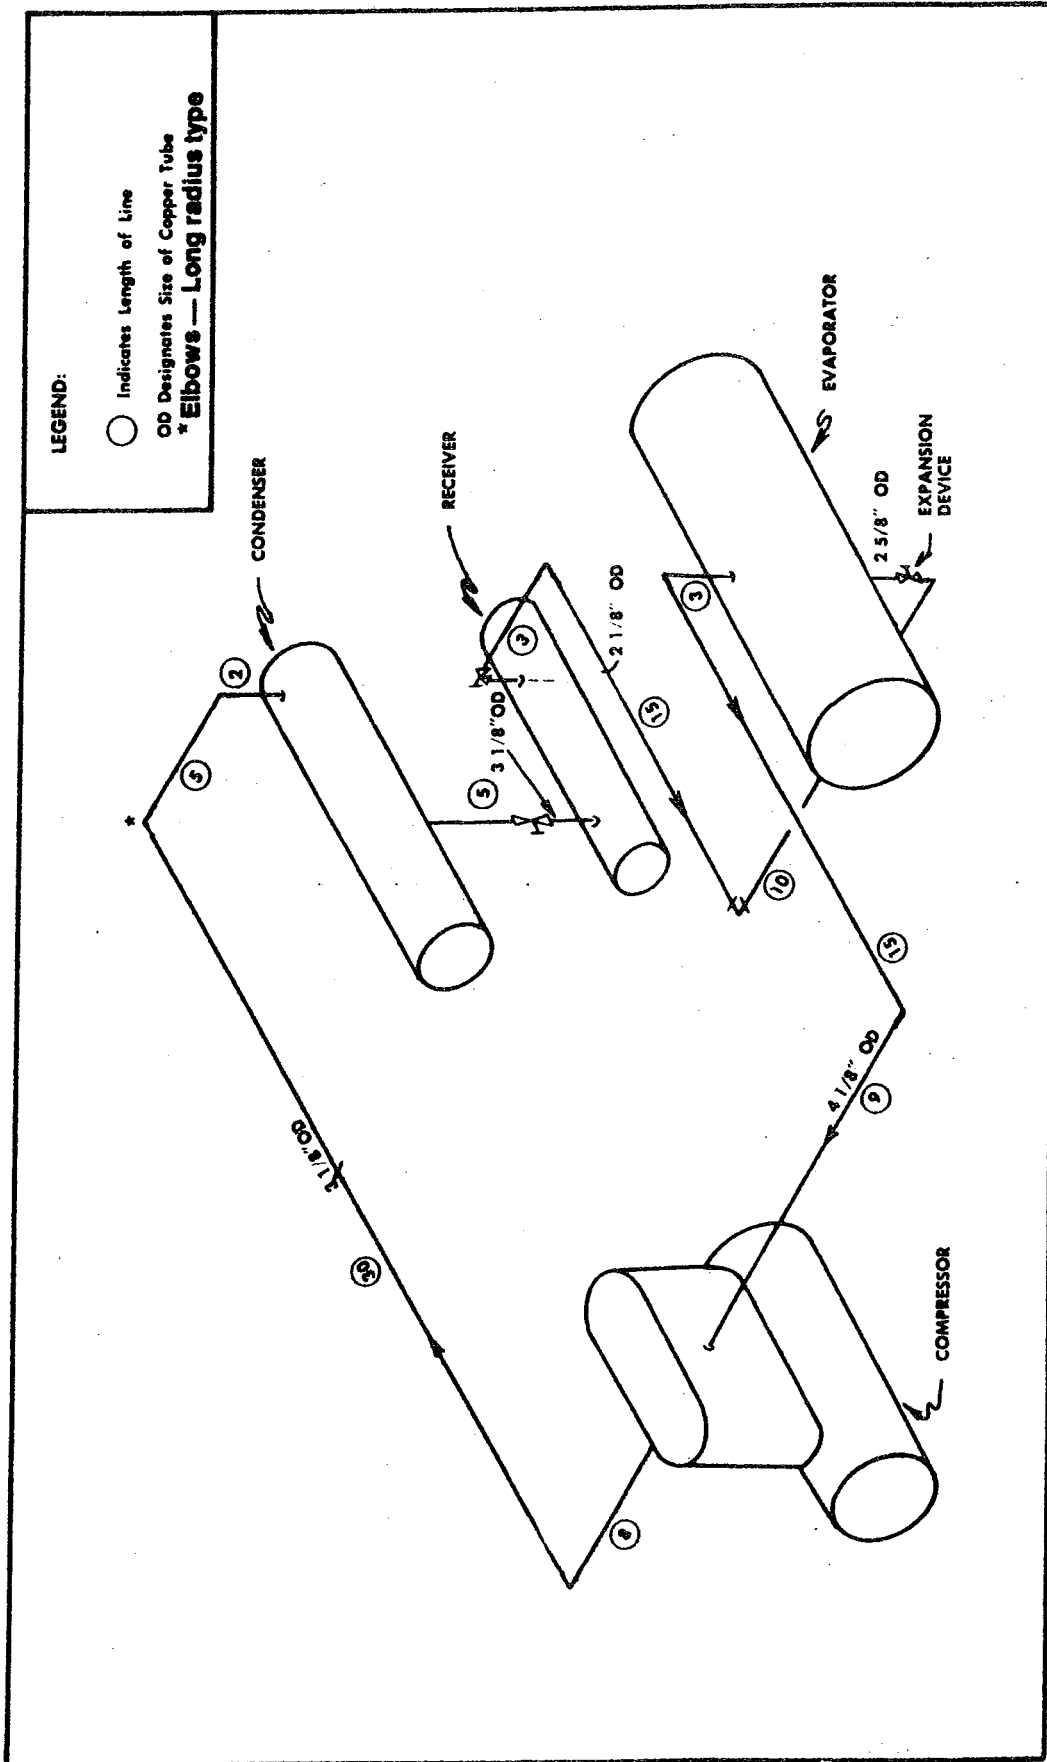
SCHEMATIC PIPING LAYOUT FOR SAMPLE PROBLEM
